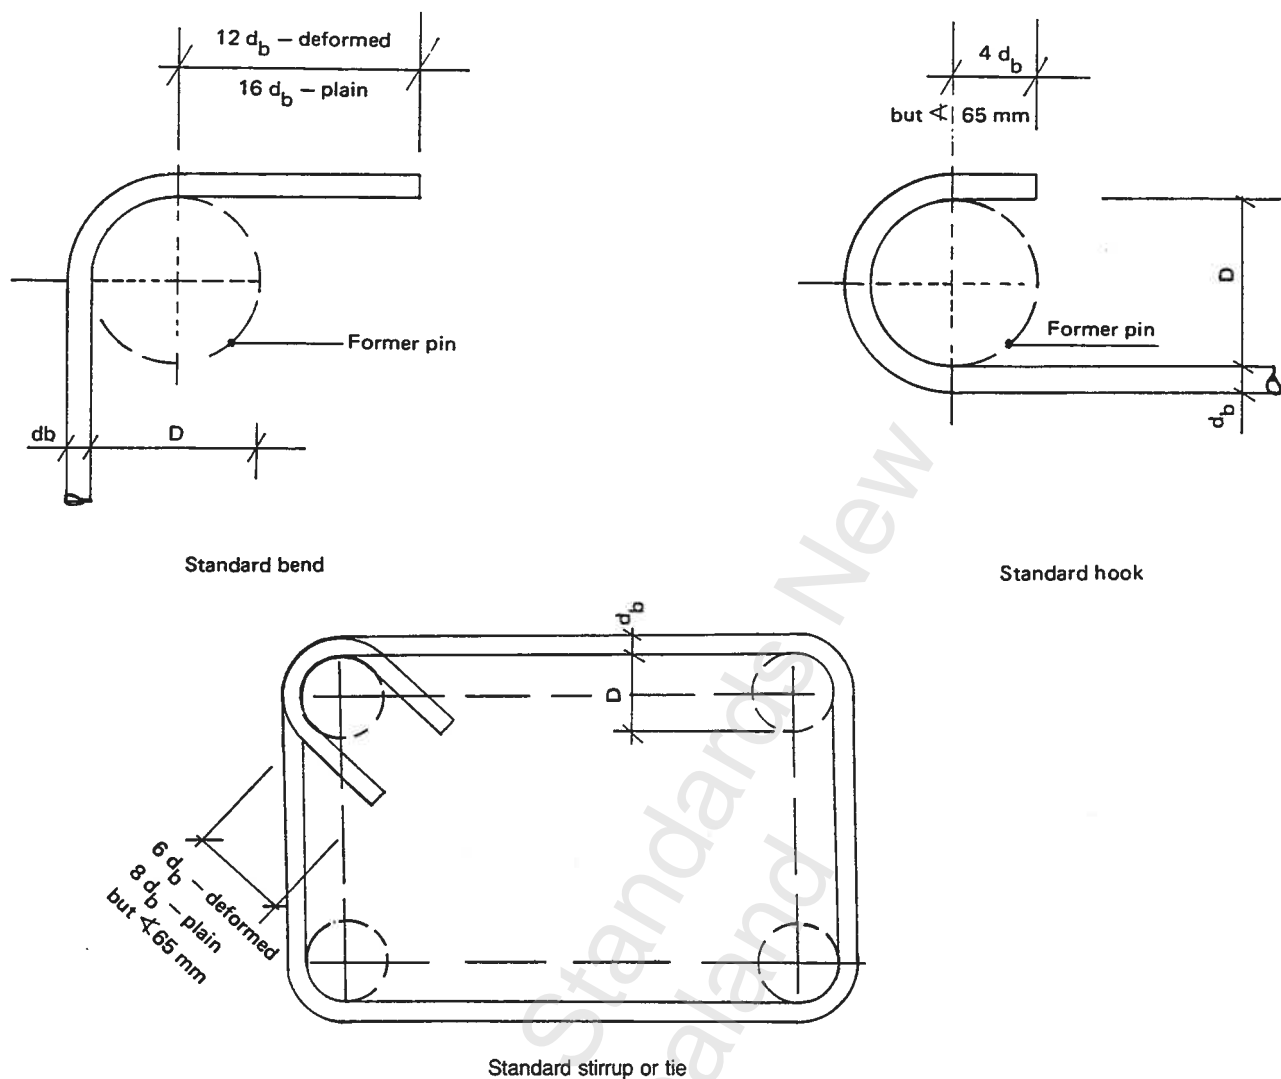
STANDARD BEND, HOOK AND STIRRUP
